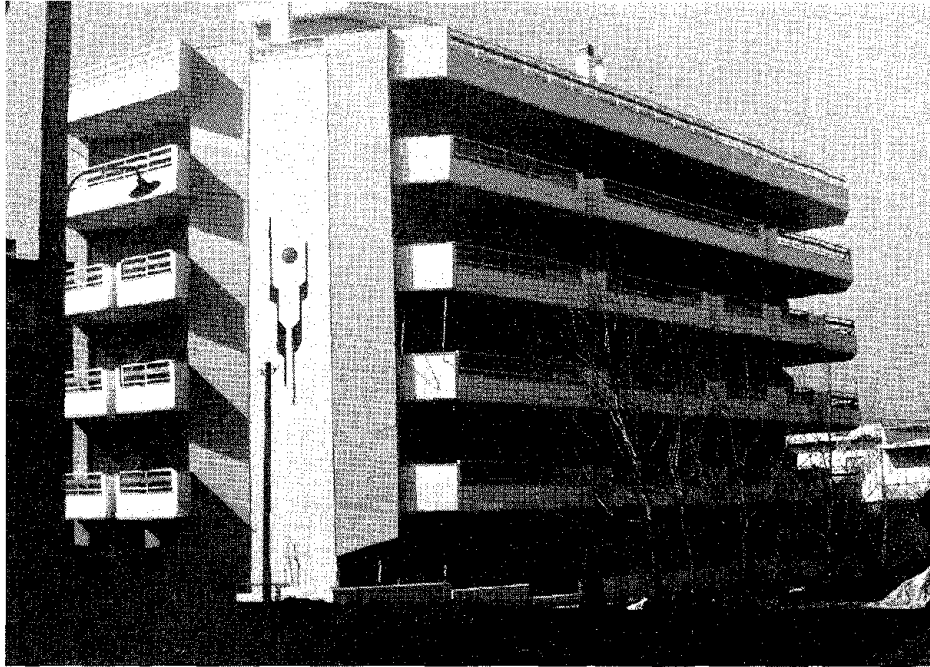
New apartment building with "pilotis" construction in Loutraki.
